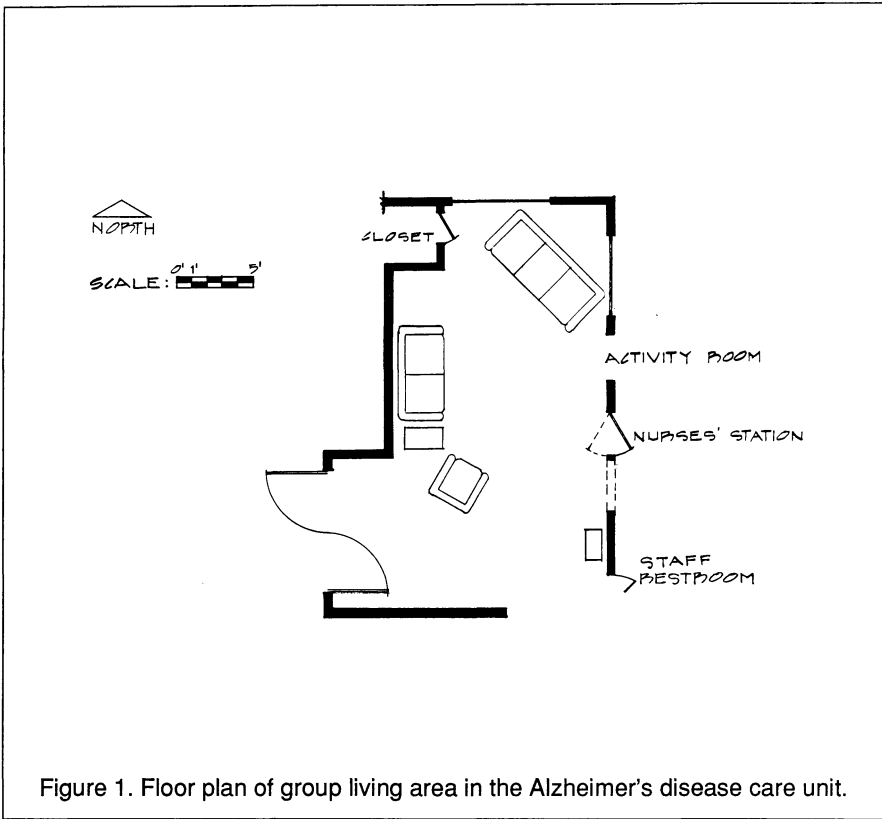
Floor plan of group living area in the Alzheimer's disease care unit.
